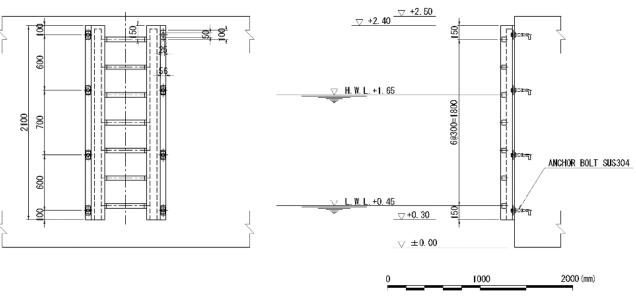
(8) Layout Plan of Ancillary of Quay No.2
